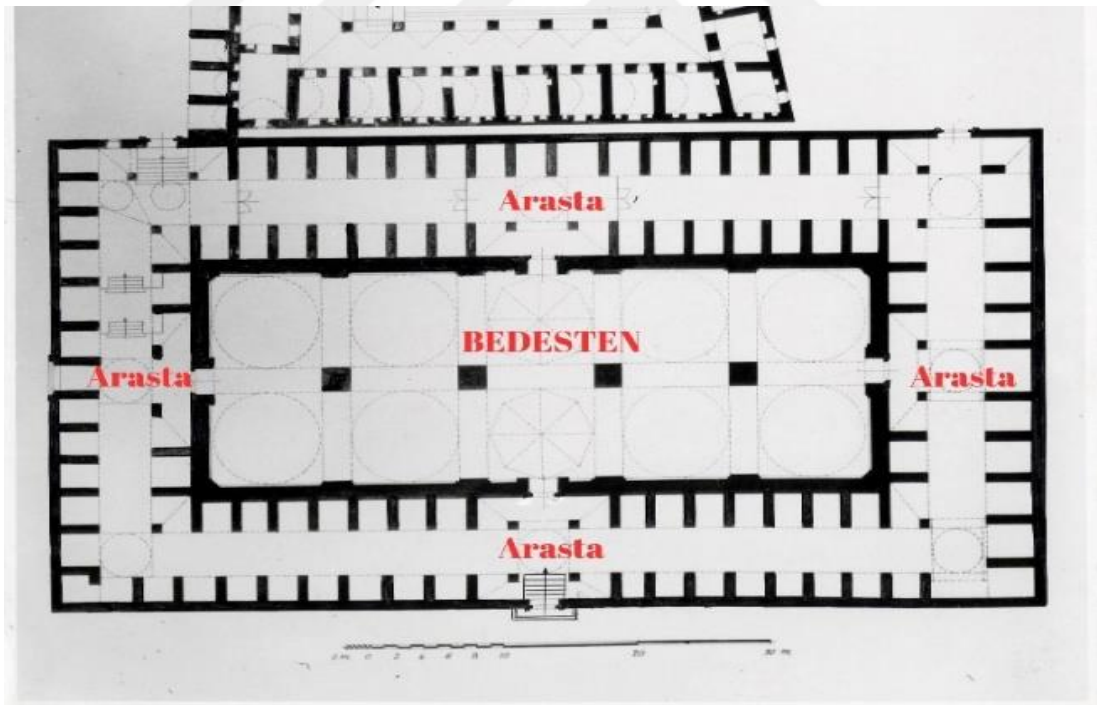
The display of the arasta and bedesten sections on the floor plan Salt Araştırma, Ali Saim Ülgen Archive (URL16).
